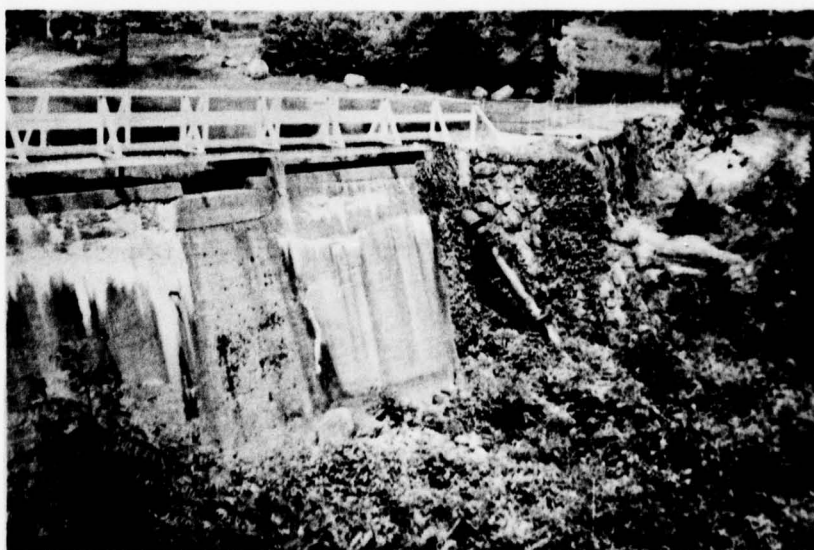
View of dam from right abutment showing added concrete dam, spillway and abandoned cast iron pipe siphon.
